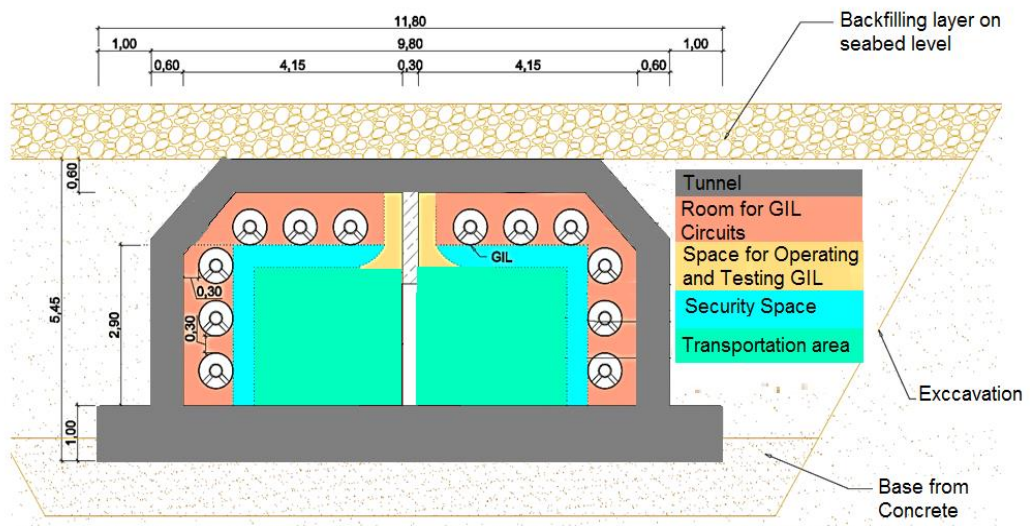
Prefabricated Immersed Tunnel Segments [122]
